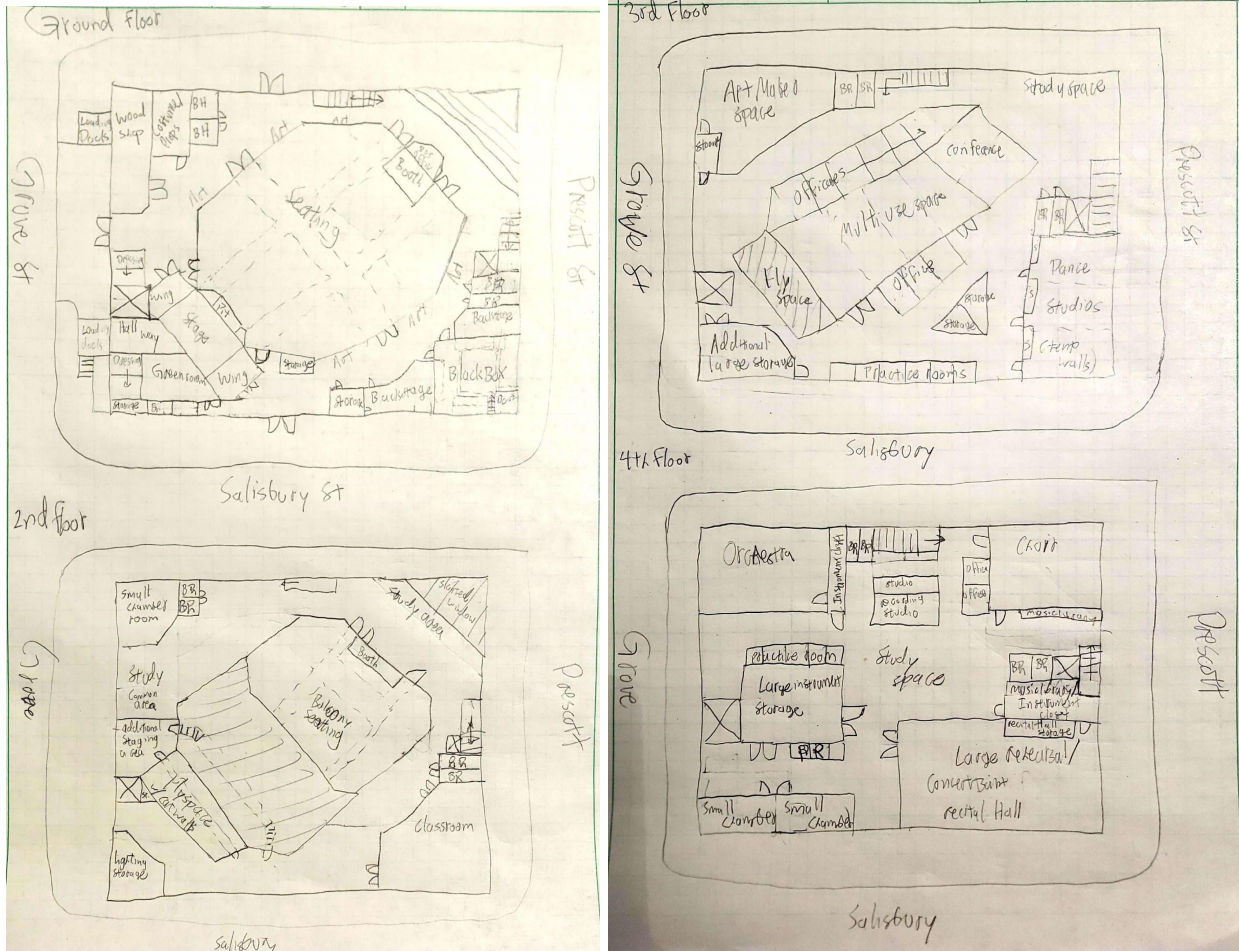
& D.11: Design #4 featuring Hand-Drawn Floor Plans from the 1st to 4th Floor
